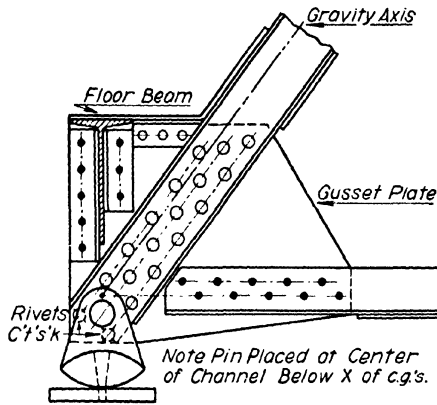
ROCKER END OF A TRUSS BRIDGE.
